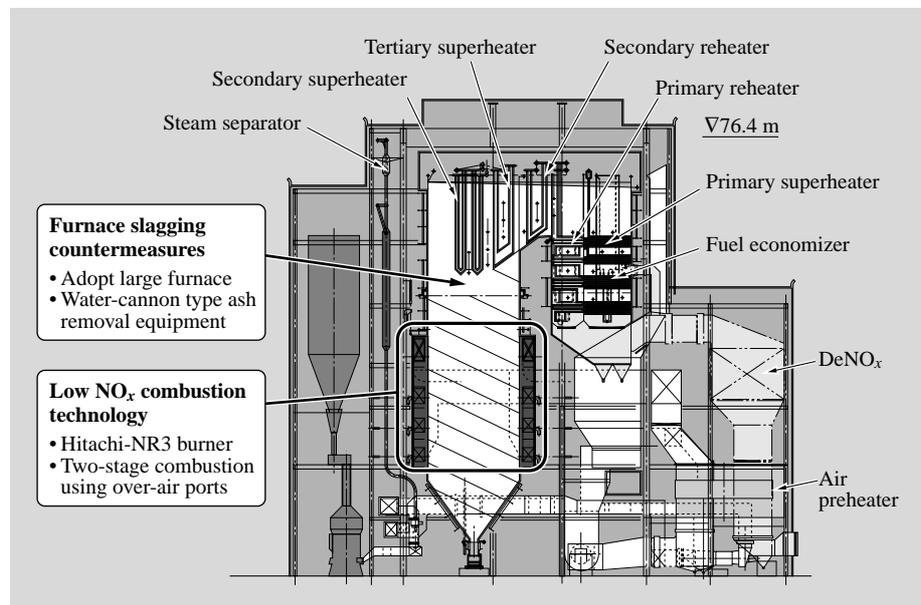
Cross-sectional View of Council Bluffs Energy Center, Unit 4 Boiler.
